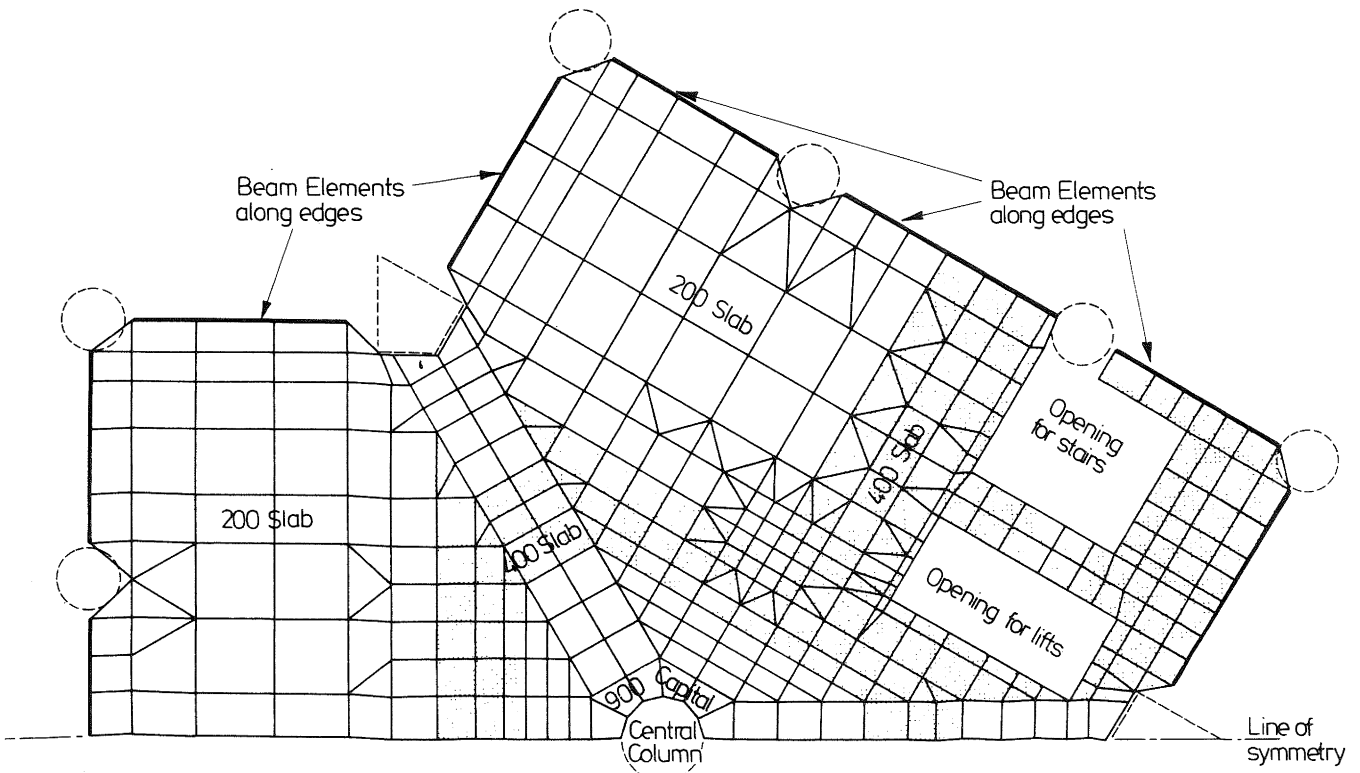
FINITE ELEMENT MESH OF TYPICAL TOWER SLAB
